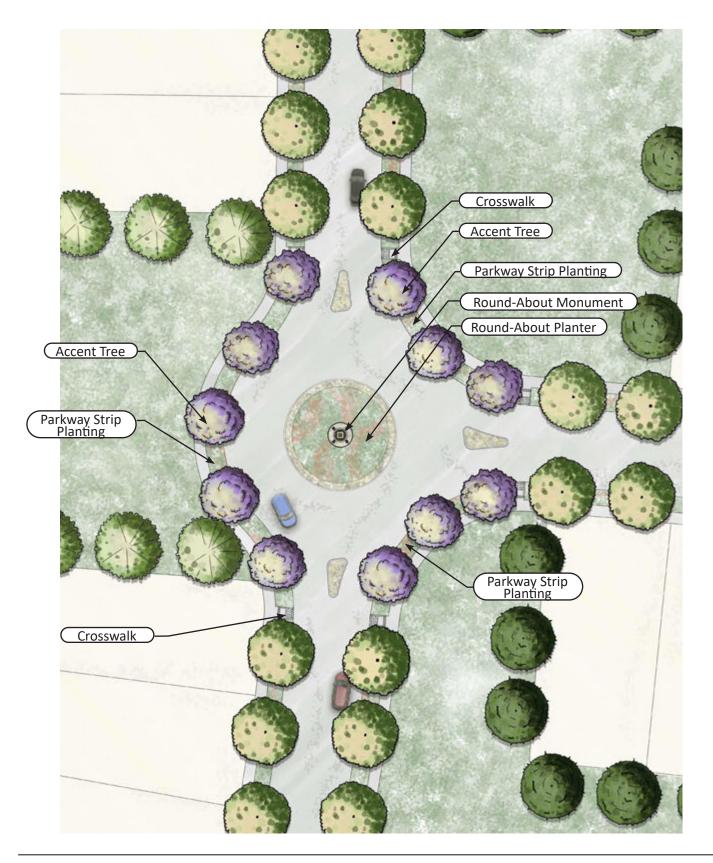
B STREET AND N STREET GATEWAY/ENTRY CONCEPT PLAN
